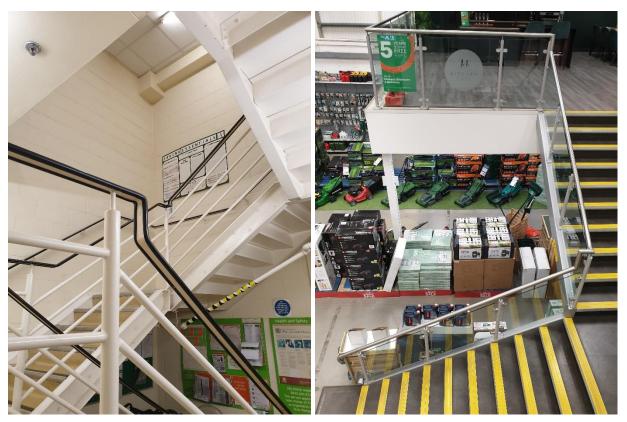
Steel stairs and handrails (Left: staff area mezzanine; Right: sales area mezzanine)
